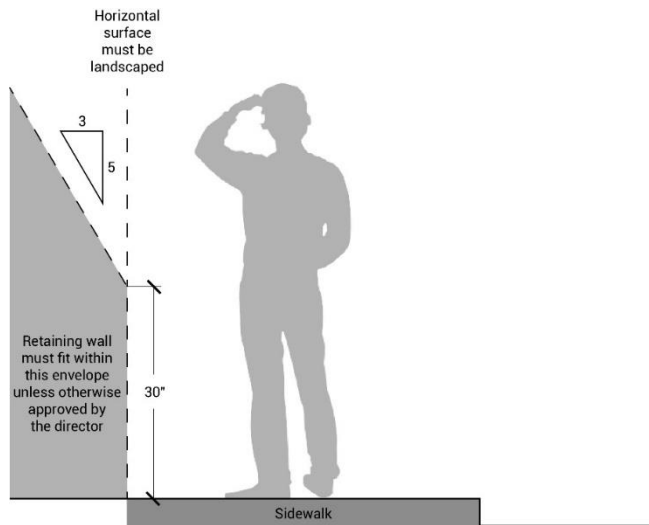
b. Allowed envelope for walls in street front setback.
